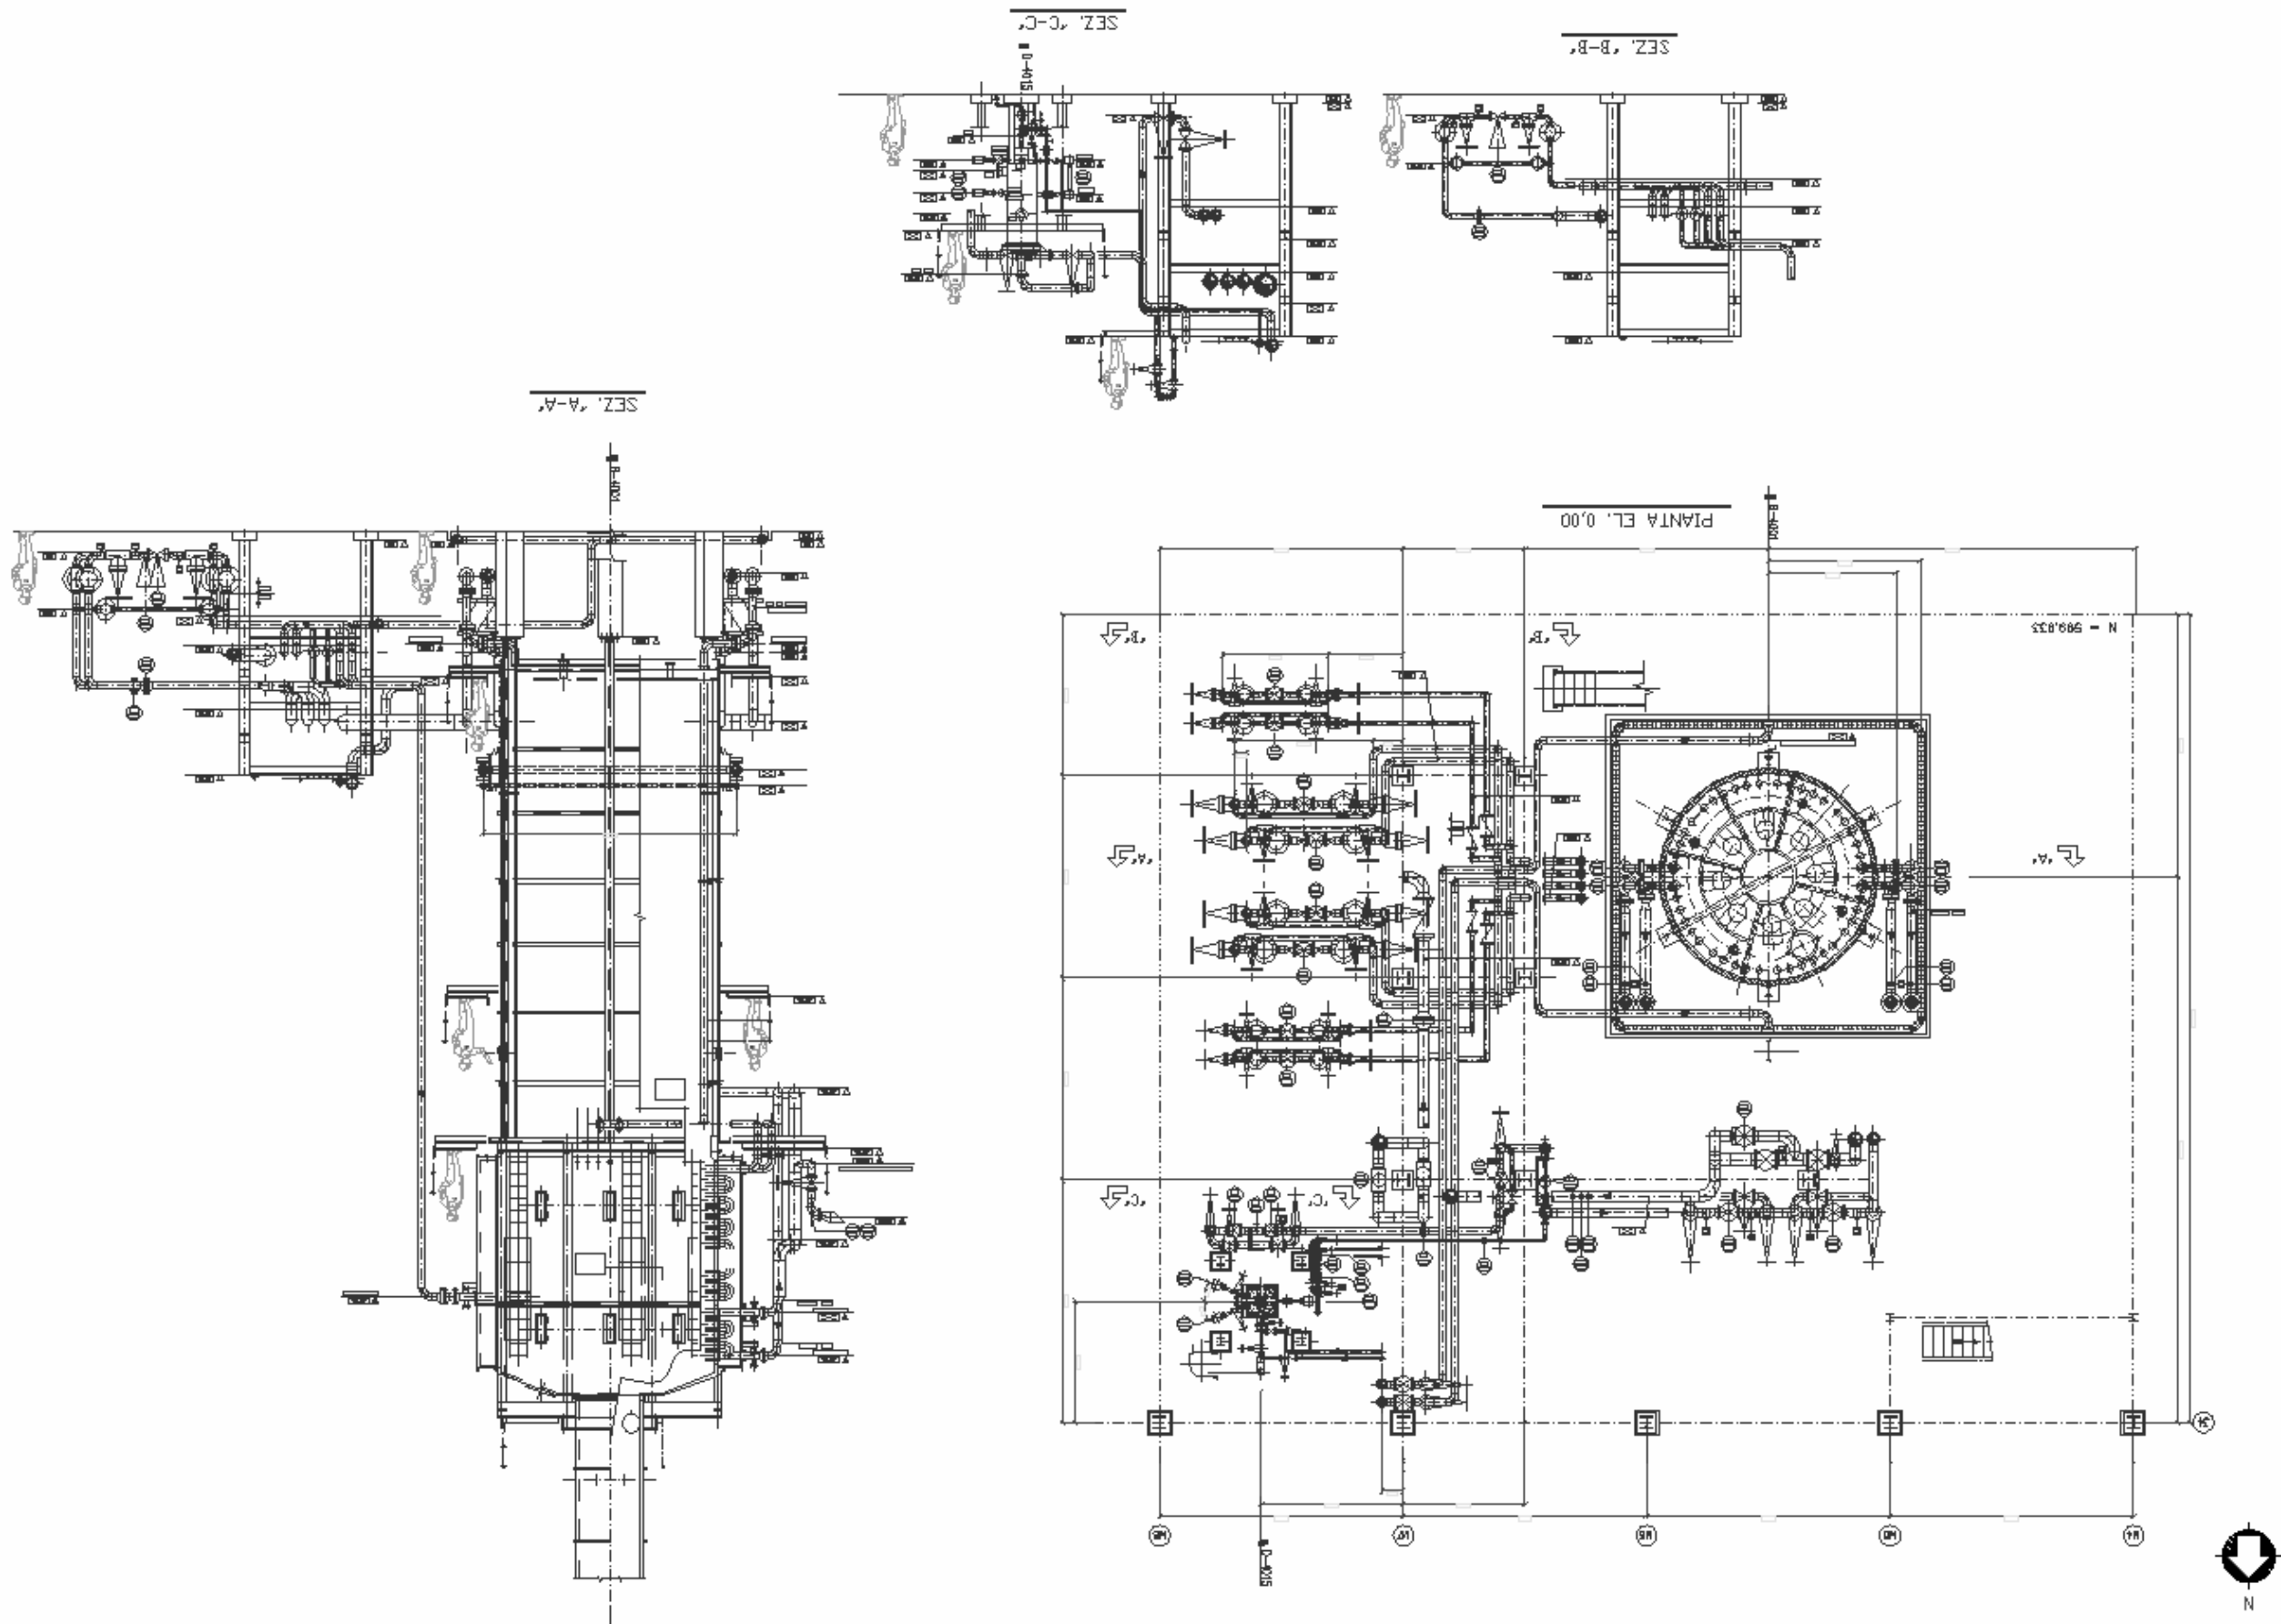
b Example of typical installations of piping around cylindrical heaters.
